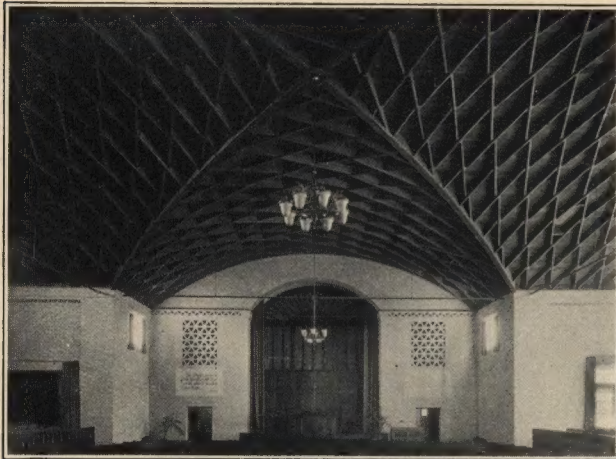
Groined Roof of Twenty-Sixth Church of Christ, Scientist. Meyer and Holler, Architects.
